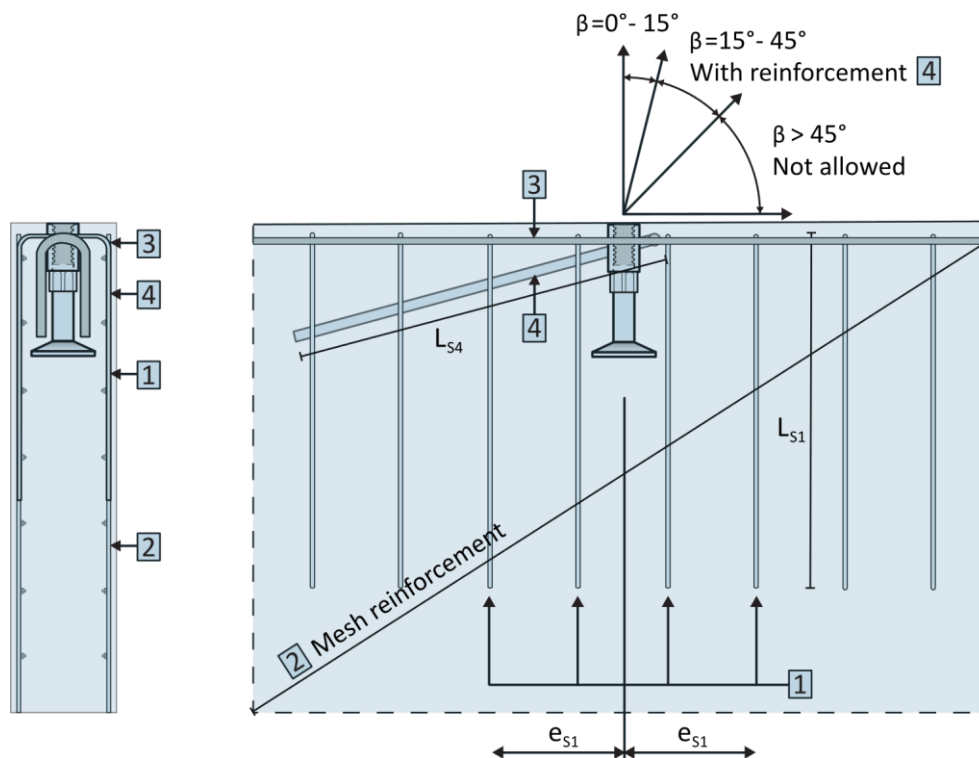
R lifting anchor reinforcement for axial pull in wall elements
